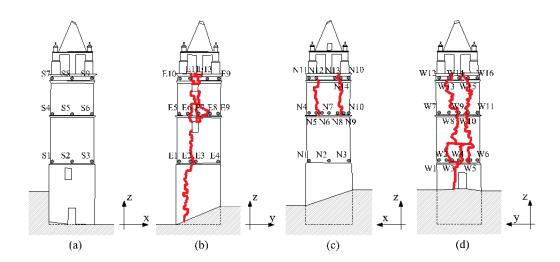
Sensor layout for AVTs: (a) South, (b) East, (c) North and (d) West façades [44].
